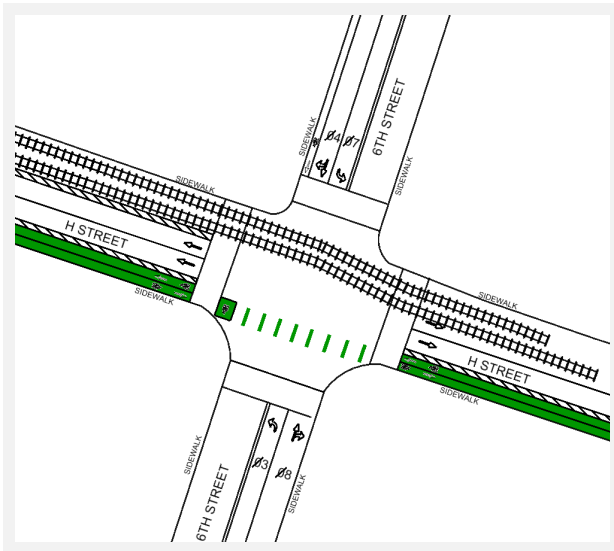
H STREET AT 6TH STREET INTERSECTION LAYOUT
